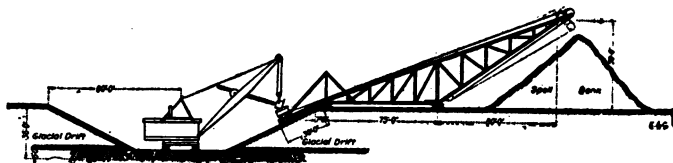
Diagram Showing Arrangement of Revolving Steam Shovel and Steel Tippie for Canal Excavation.
